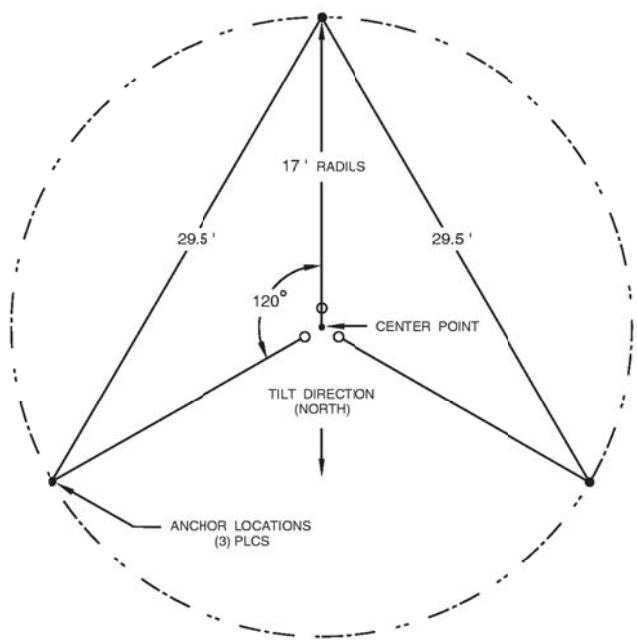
Top View of Base and Guy Anchor Layout
